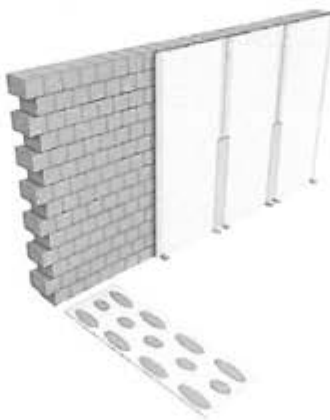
Graphical representation of wall lining with one layer of NIDA plasterboard
